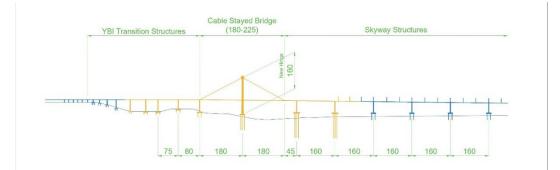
4th proposed variant of the Oakland Bay Bridge.
